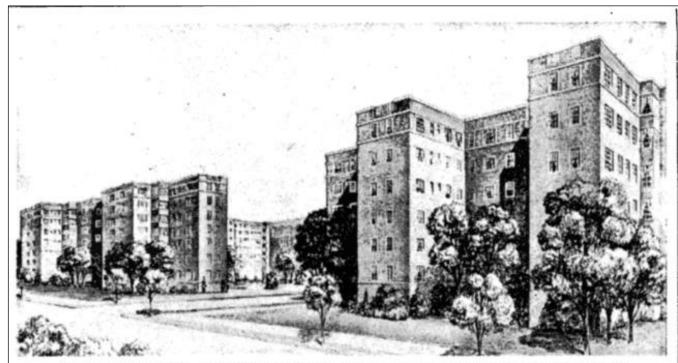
An original sketch of the Riverdale Park Apartments showing three proposed buildings. The U-shaped building in the far background was not constructed (New York Times 1939e)
